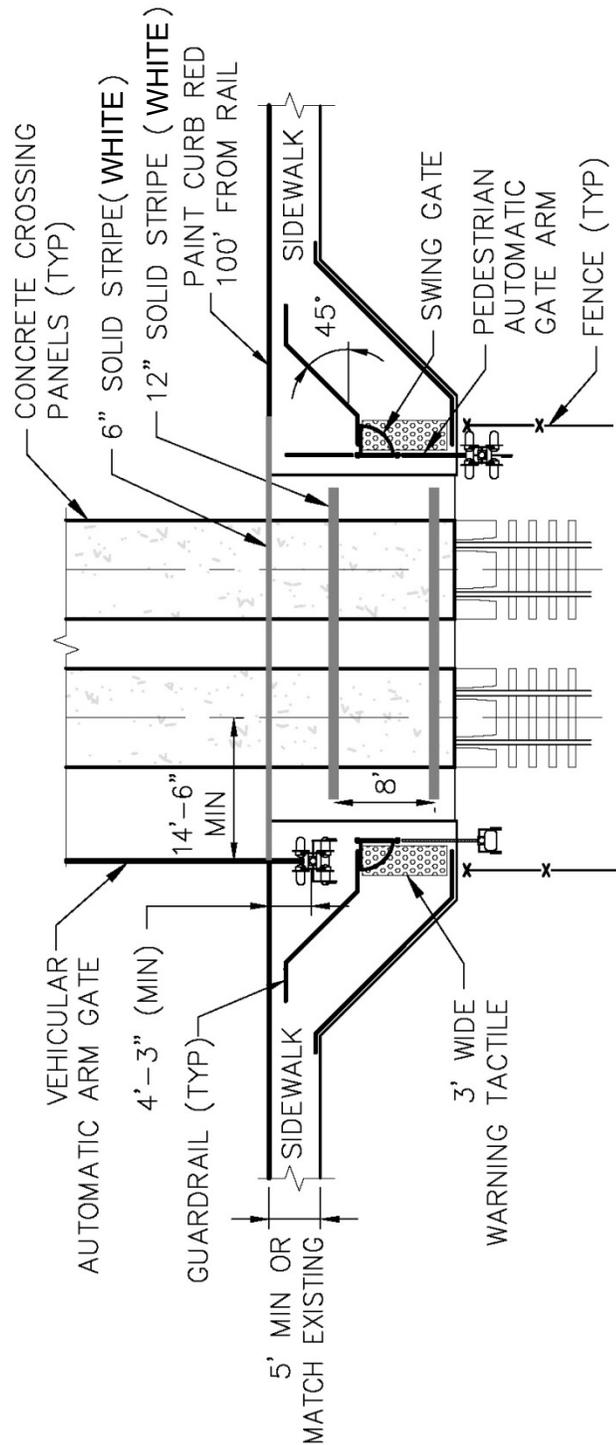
Typical Pedestrian Sidewalk at Vehicular Crossing
